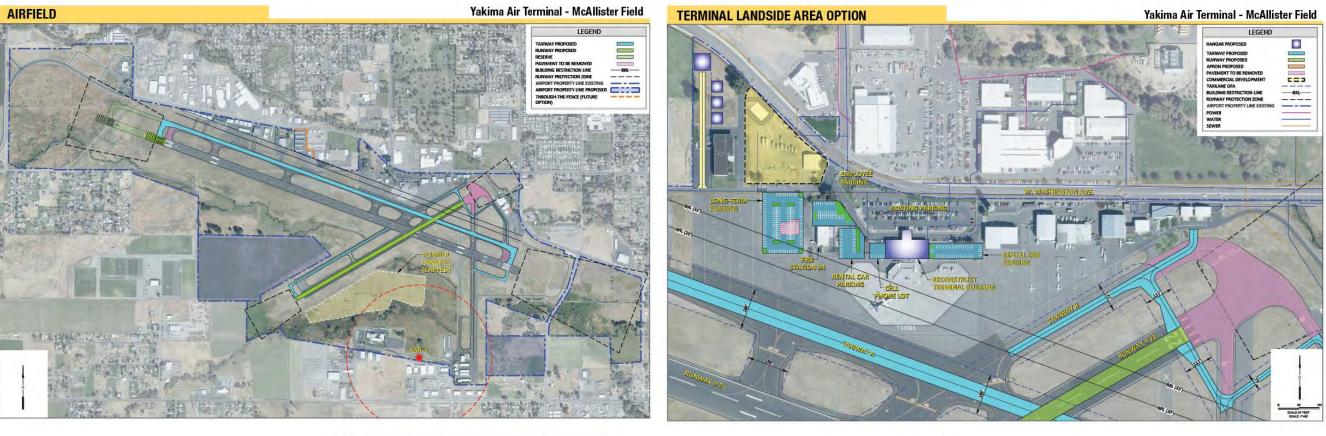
Airport Layout Plan Update – Proposed Improvements
